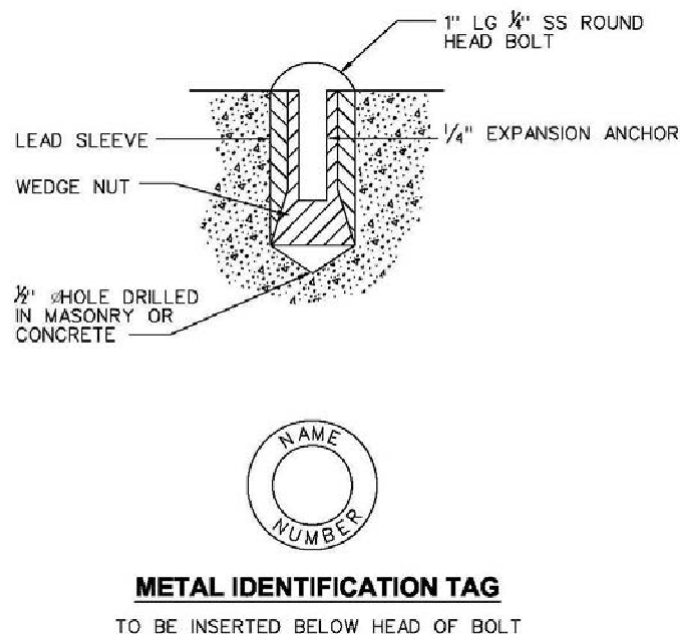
Deformation Monitoring Point in Masonry or Concrete Slab
